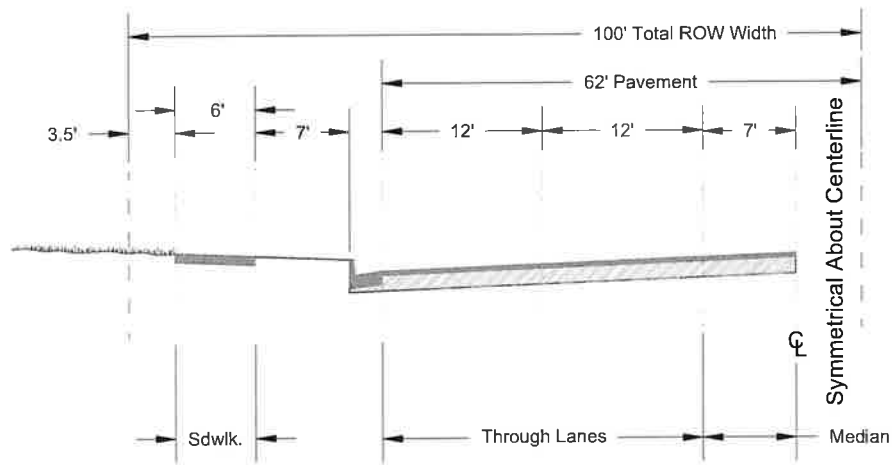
Typical Urban Principal Arterial Cross Section (4 Lane)
